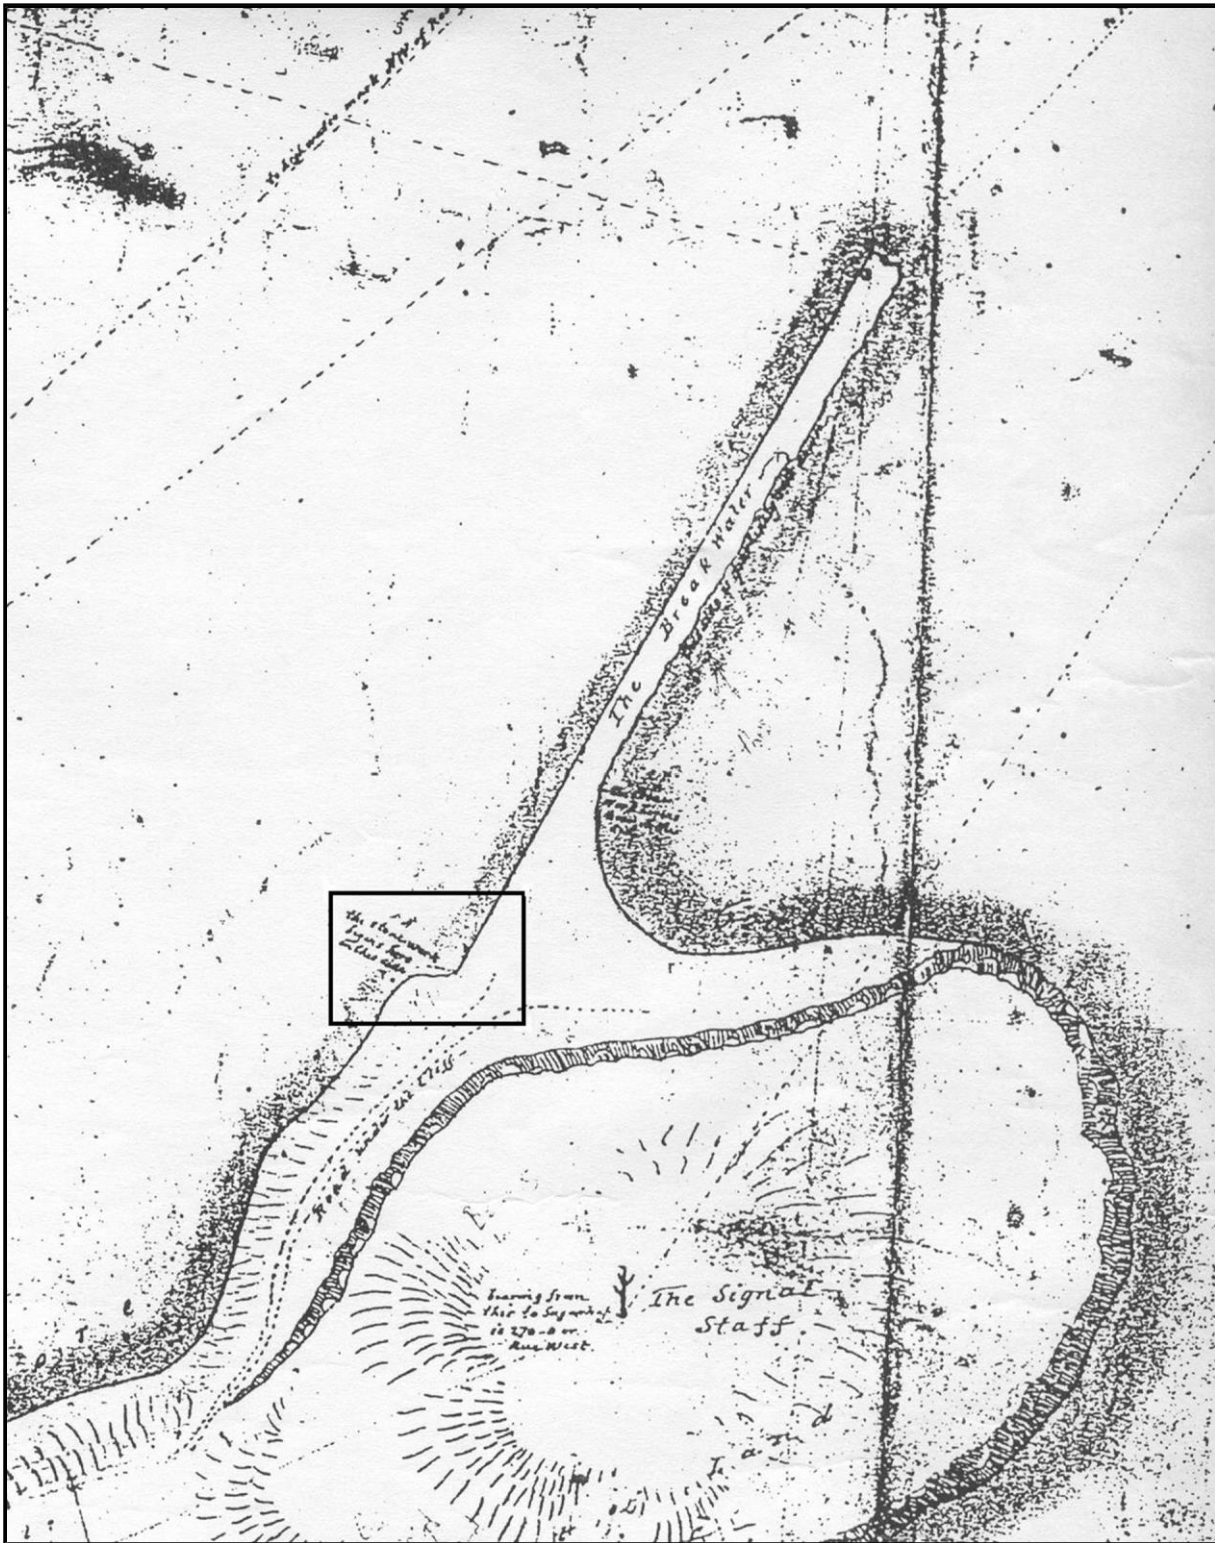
Extract from plan of the Town of Newcastle 1830 showing note: “the stonework begins on both sides”
